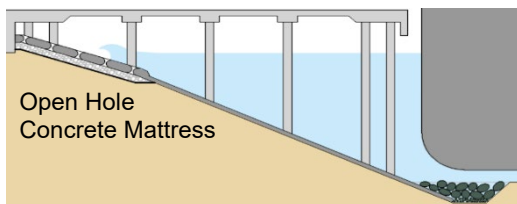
Open Hole Concrete Mattress Protection Below Pile Jetty
